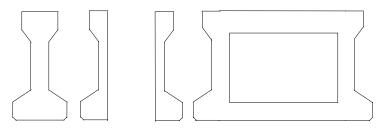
Box Beam Section from Pretensioned Girder Section
